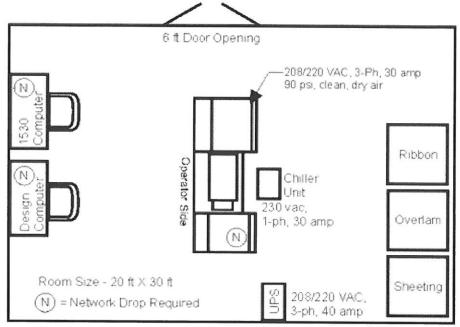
Typical room layout for 3M's DLP processing.
